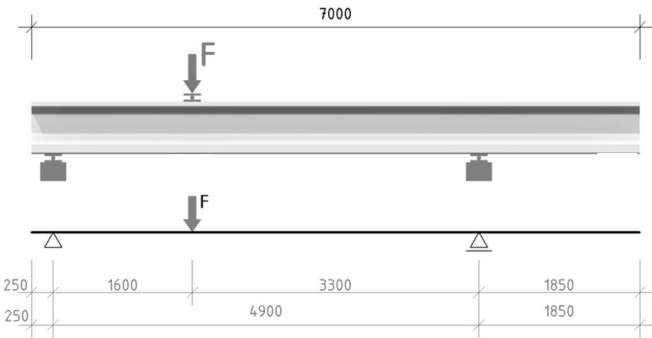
Structural scheme of the specimen – 3-point loading scheme
